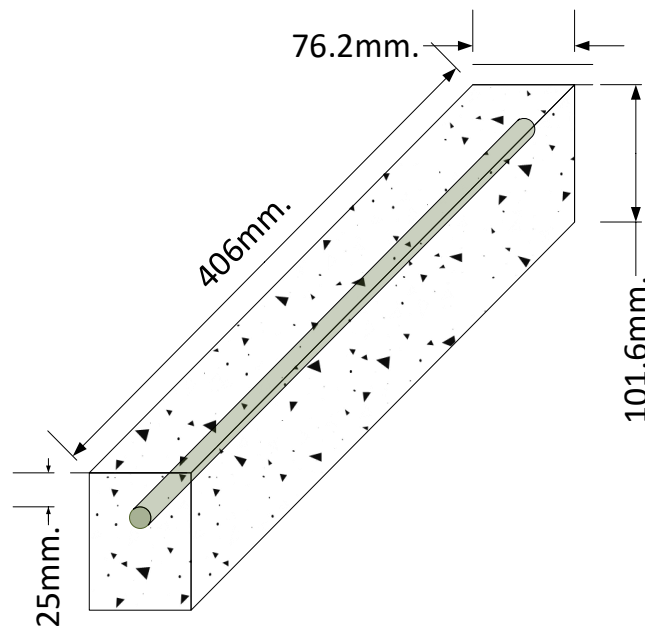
Modified ASTM C666 concrete specimen geometries containing GFRP reinforcing bar
